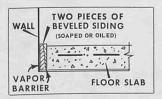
The 1-inch joint between the basement walls and floor is formed with pieces of siding. After the floor slab has cured, the pieces of siding are removed, and the joint is filled with hot coal-tar pitch. Do not backfill dirt against the walls until the first floor of the house is in place.
